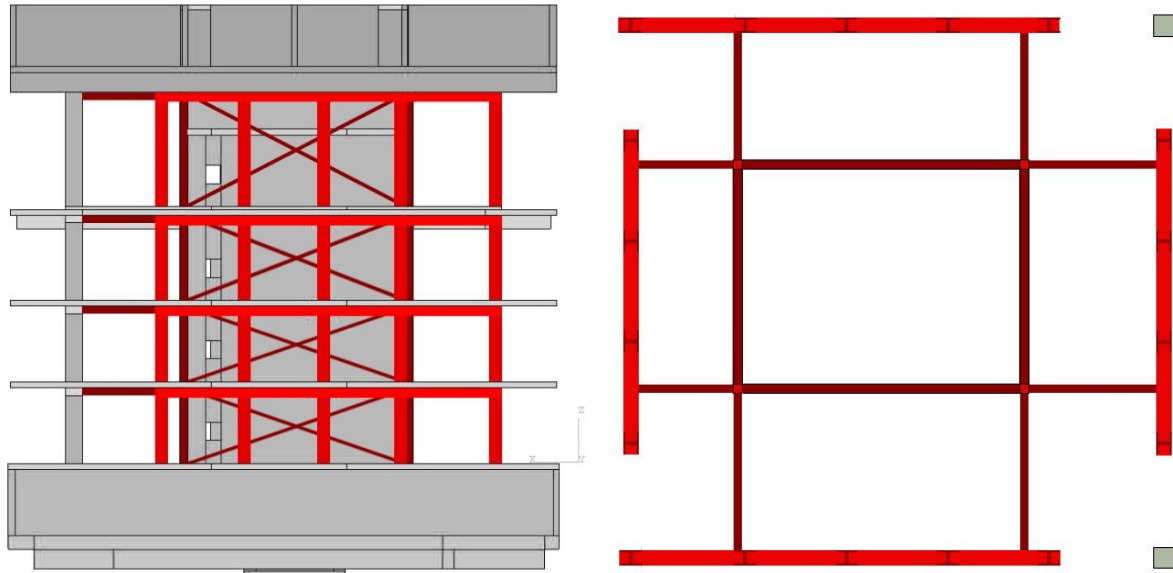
Side view (left) and top view (right) of the steel bracing (red) at the first four floors.
